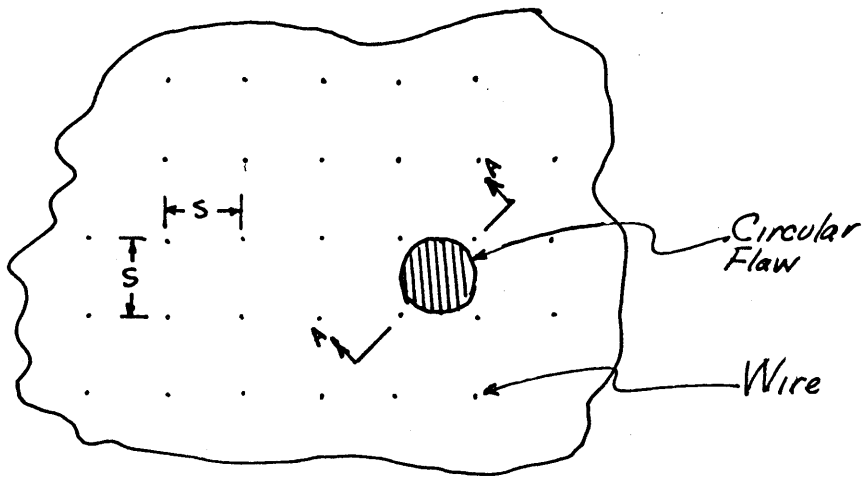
Cross Section Through Wire Reinforced Concrete at a Flaw.
